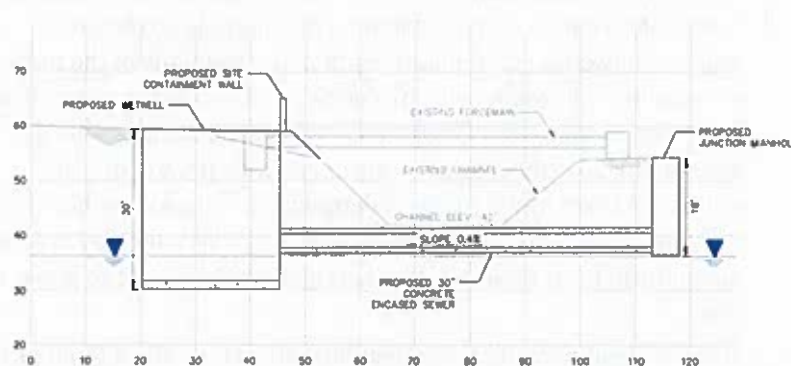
Proposed Wetwell and Gravity Trunk Section View
